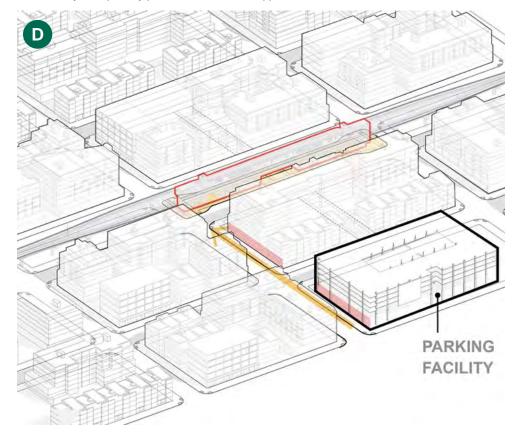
D - Site parking facility to support activated development and public realm adjacent to the station
